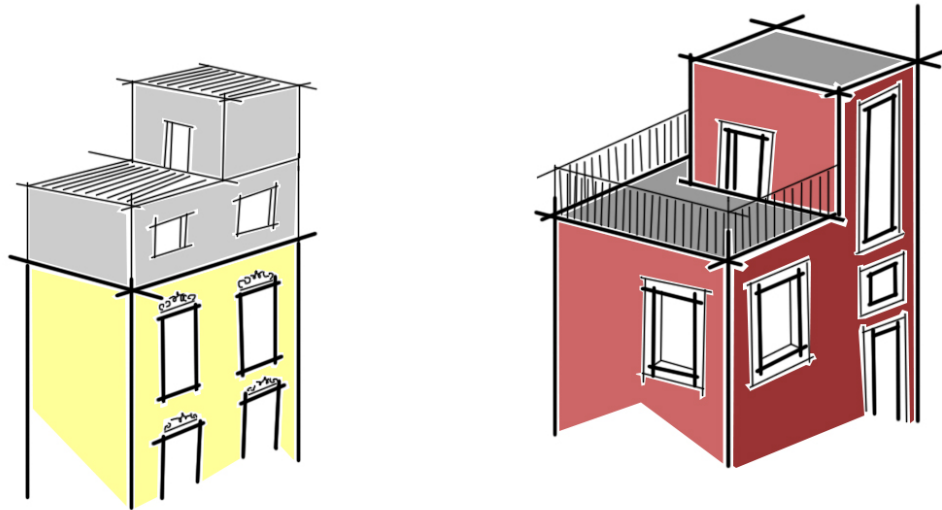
, 69b) Diagram of two types of vertical additions: a light structure added to an existing building, and a single room, the structure of which is integral to the building, but does not occupy the whole floor footprint.
